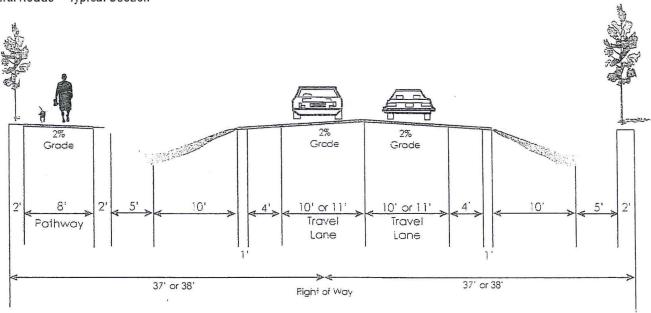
is the typical section for a rural collector. For local secondary roads, a typical section would have a 50-foot right-of-way and would include 20- to 24-foot surface widths (10- to 12-foot travel lanes), depending on average daily traffic (see Table 4.5). These local roads would include 2- to 4-foot shoulders, wide enough to accommodate pedestrians.
